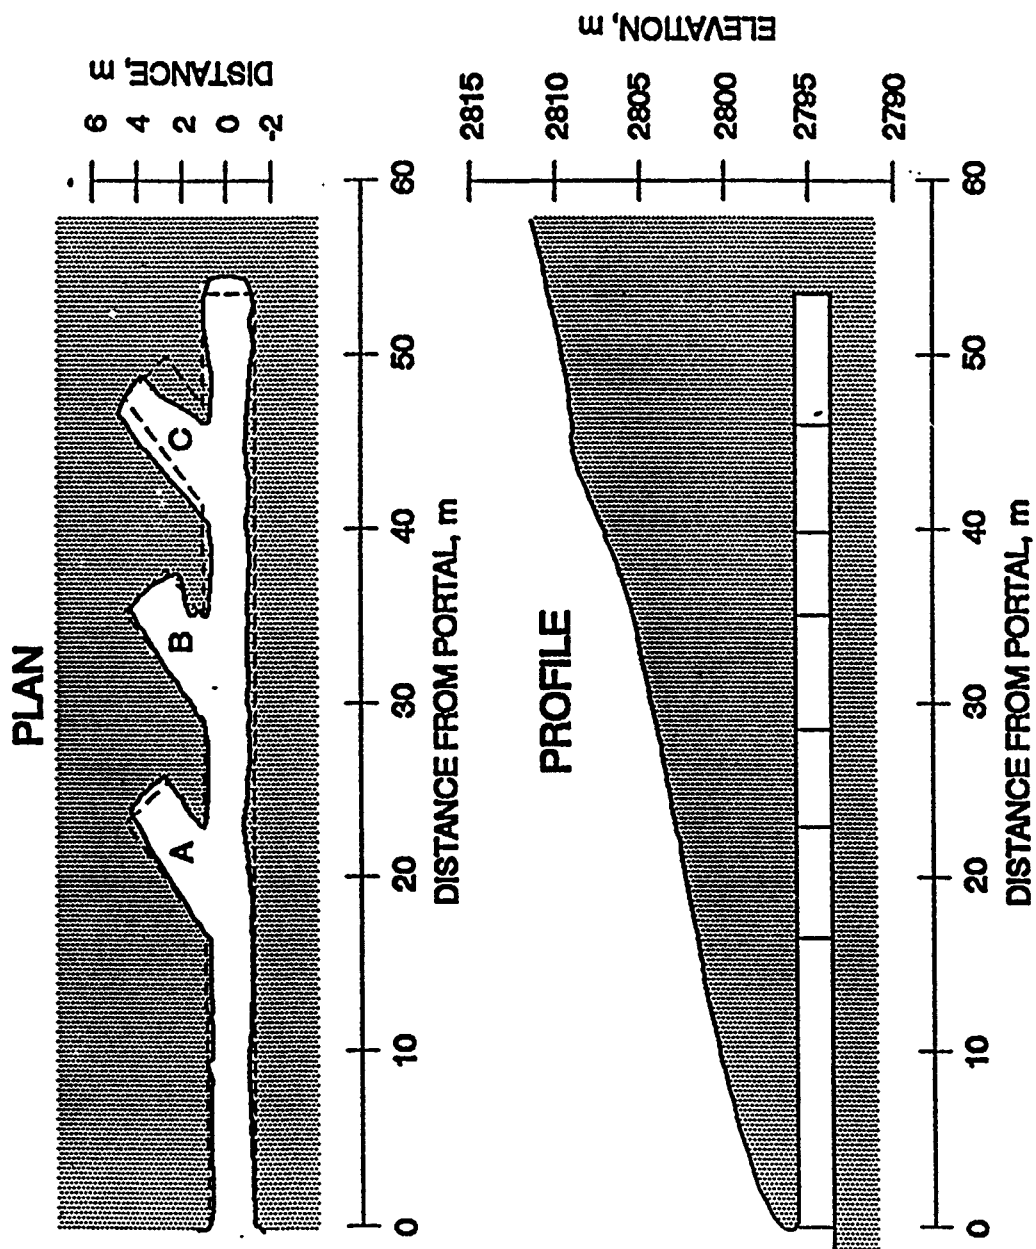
Longitudinal tunnel cross-section (plan and profile) for 1/3-Scale Camp Stanley Validation Test. Letters identify donor (B) and acceptor adits (A and C).
